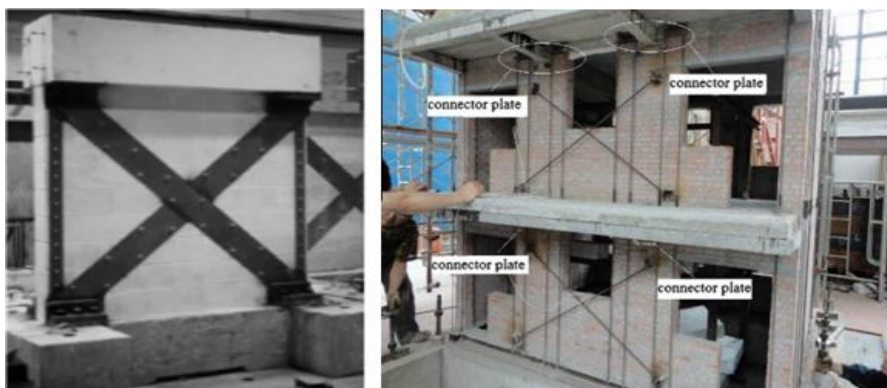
External reinforcement (Elgawady & Lestuzzi, 2004)
